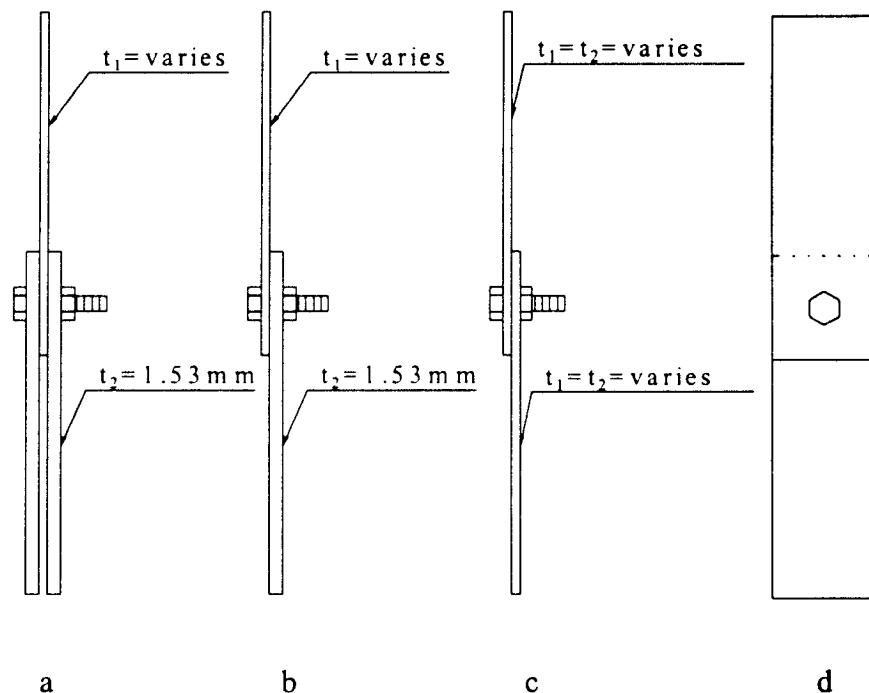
Side View (a: DS, b: TTSS, c: SS) and Front View (d) of Test Specimens
